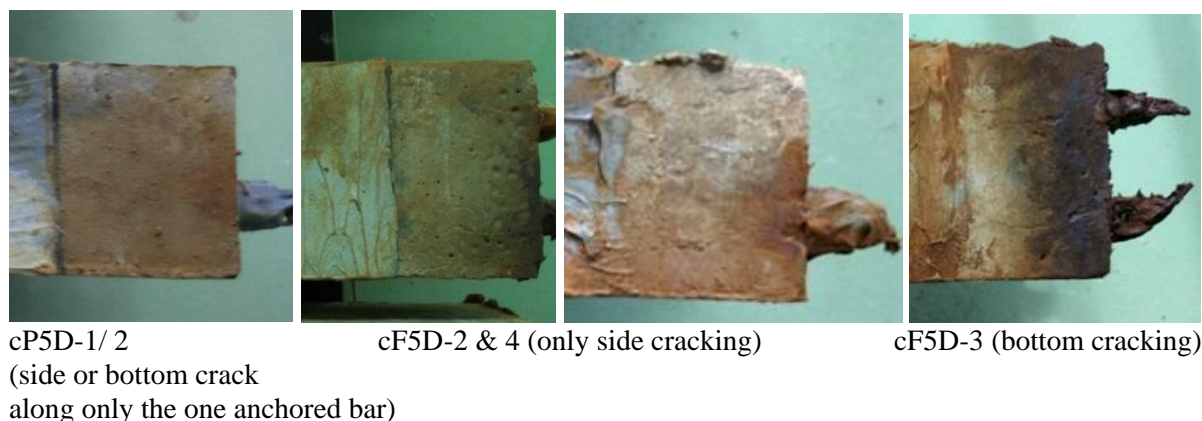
Cracking along the anchorage length due to corrosion of steel reinforcement.
